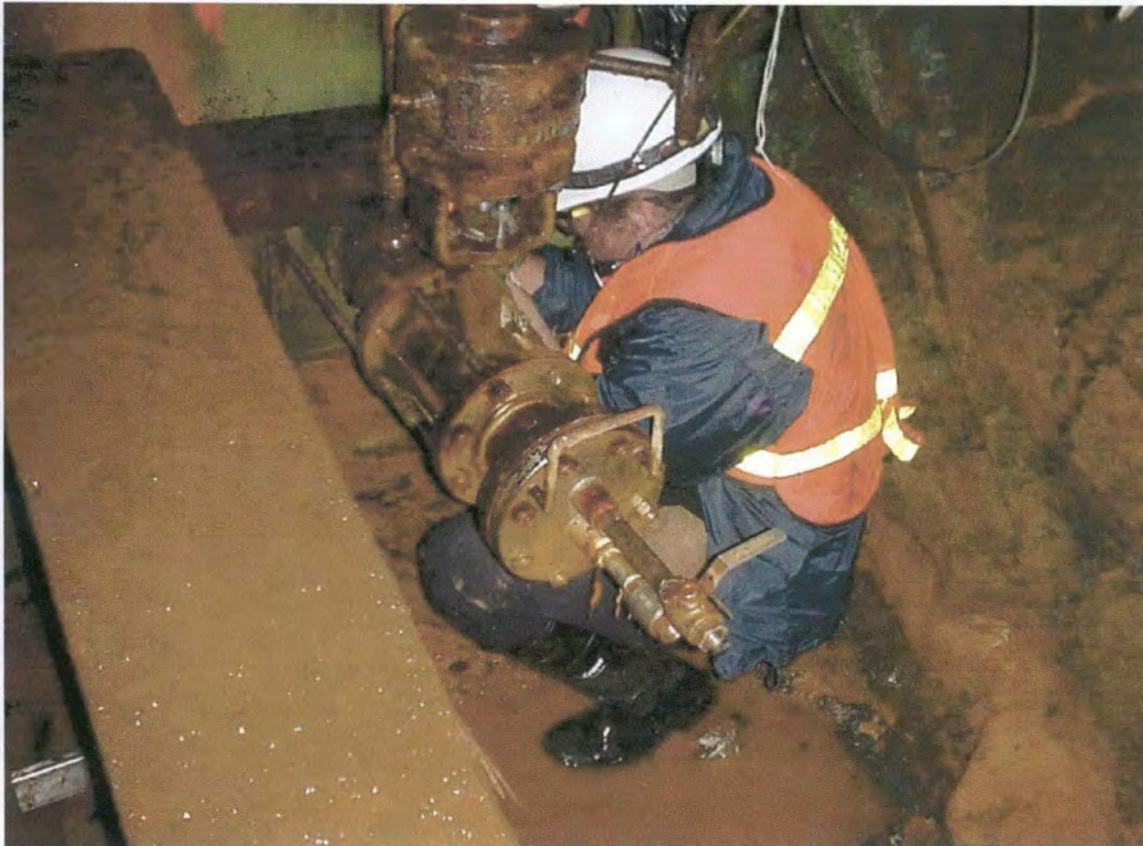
Right drain pipe and valve (November 2, 2000).
